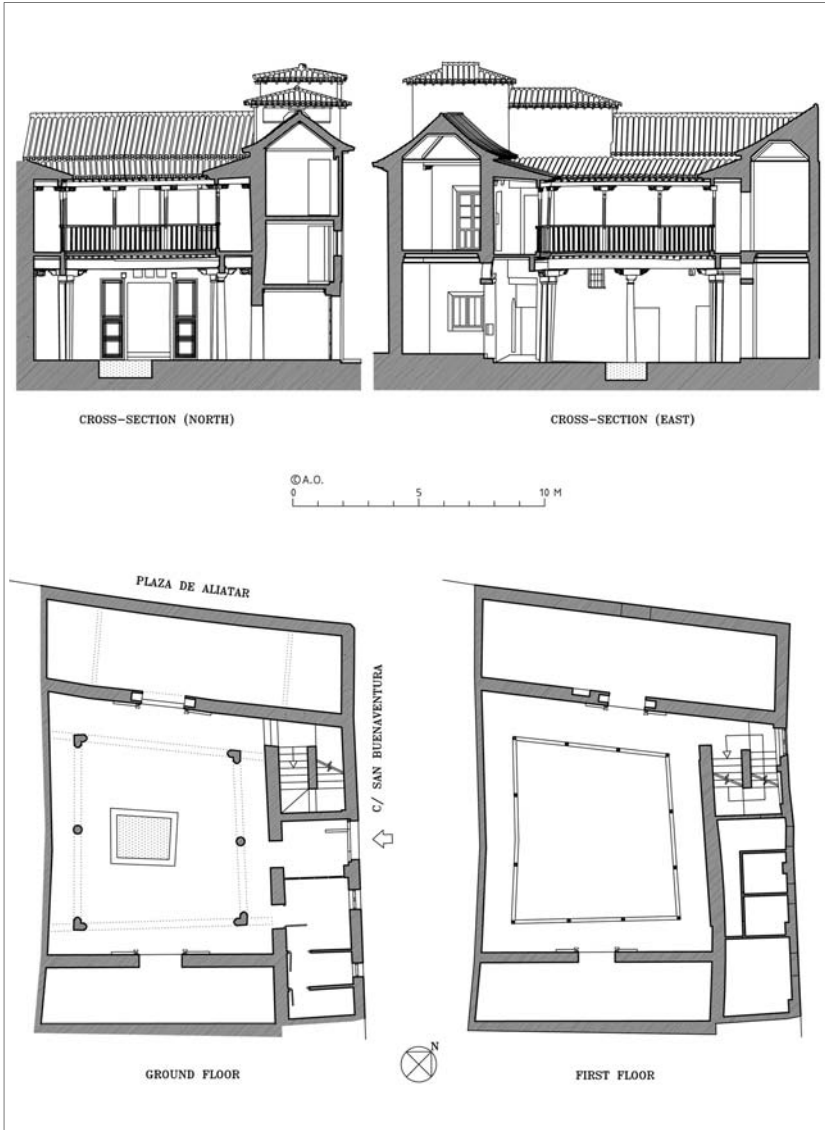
House at No. 7 Calle de San Buenaventura: plans and cross-sections (proposed restoration project).
